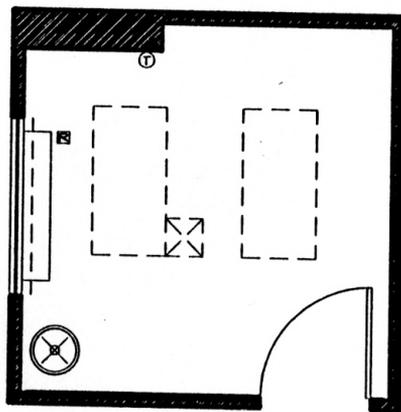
Plan of Independent Living Work Area - Site 3.
